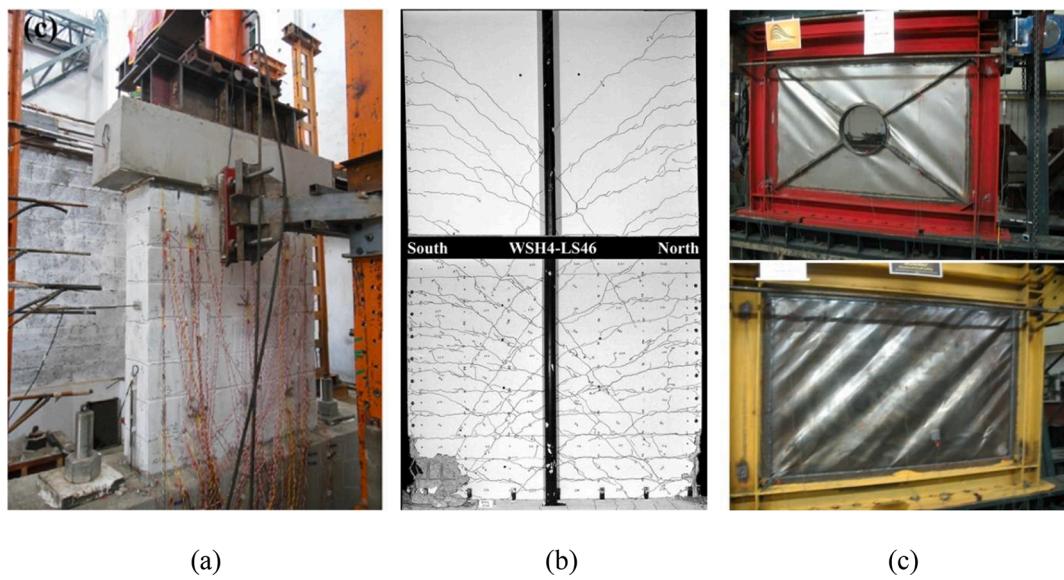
Shear failure of (a) masonry wall [155], (b) RC wall [564], and (c) steel plate wall [159].
